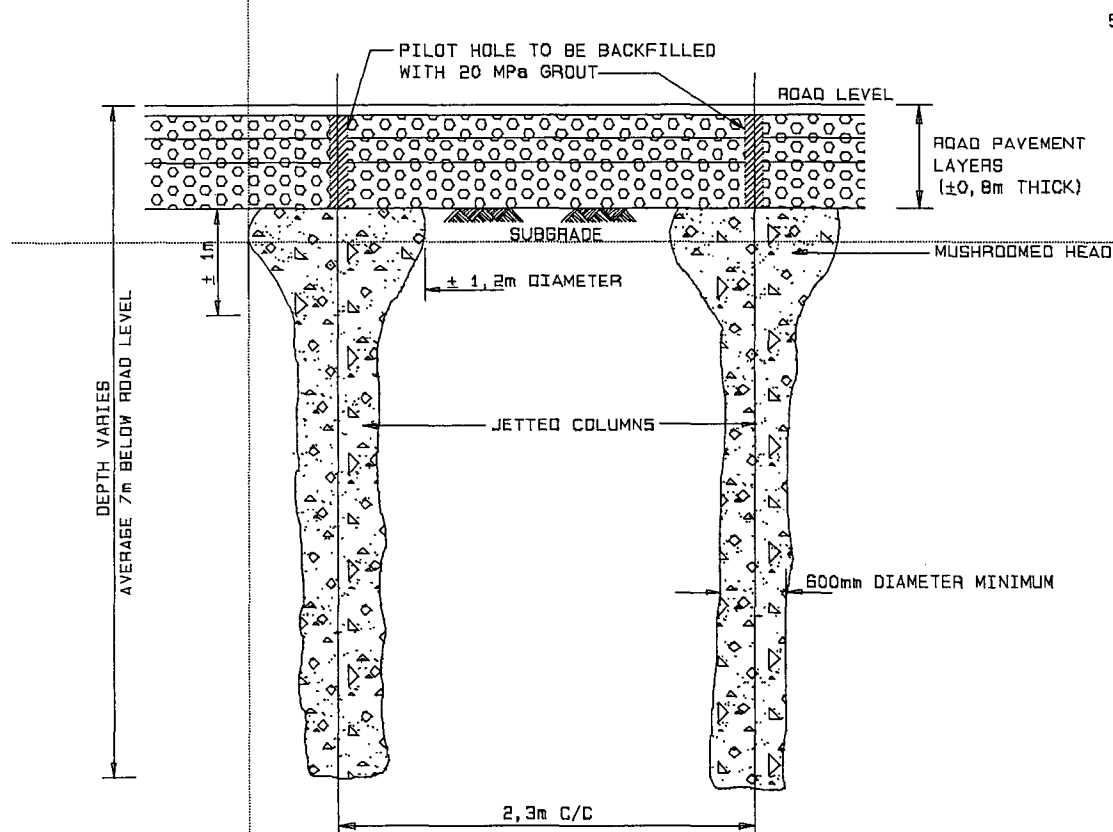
Design drawing of jet grouted columns, source: AFRICON
